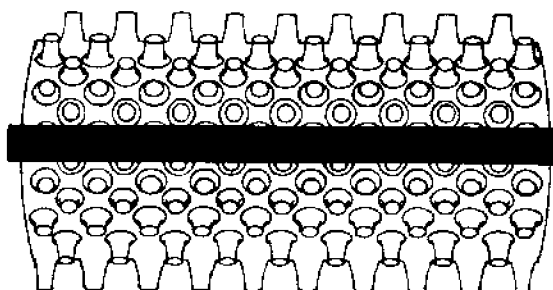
A sheepfoot roller will help compact the soil used in pond construction.
